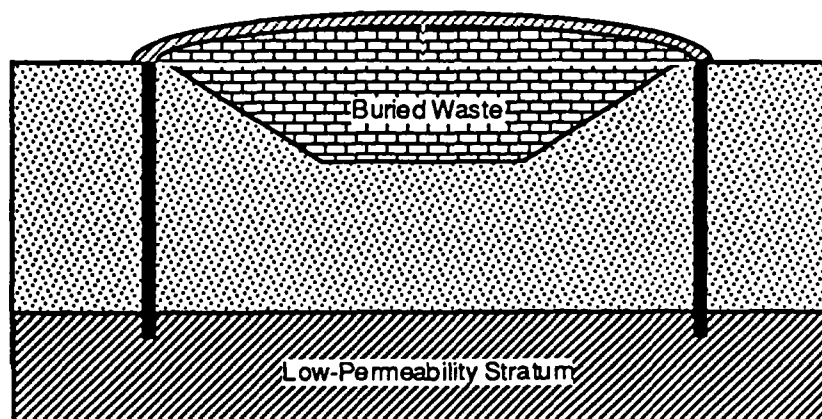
Example of Vertical Cutoff Wall to Limit Long-Term Contaminant Transport.
